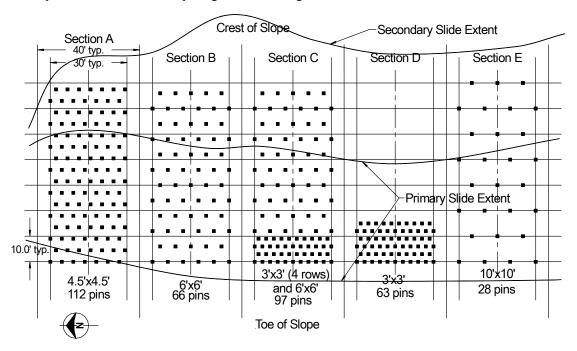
Plan view of US54-Fulton site showing selected reinforcement configurations for Sections A through E.
